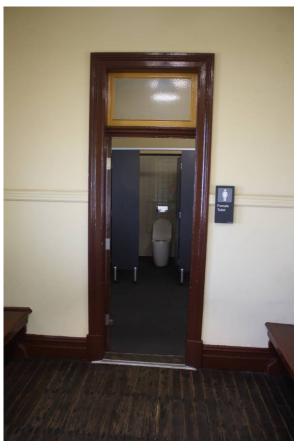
Internal entry door from the lobby room into the existing female toilets showing contemporary fitout.
